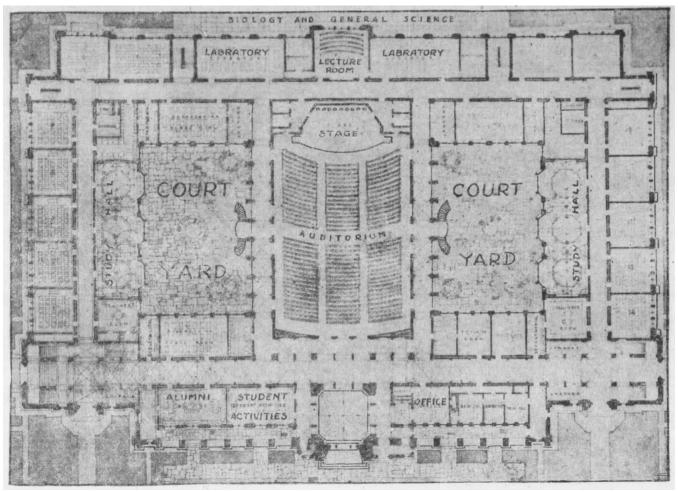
The first floor plan for the 1928 Baltimore City College building. Typical features of the era were the building's rectangular plan; central interior hallways; classroom and specialty spaces, like study halls, a student activities room, a lecture hall, and an alumni room; and a publically accessible auditorium.¹⁰⁹
